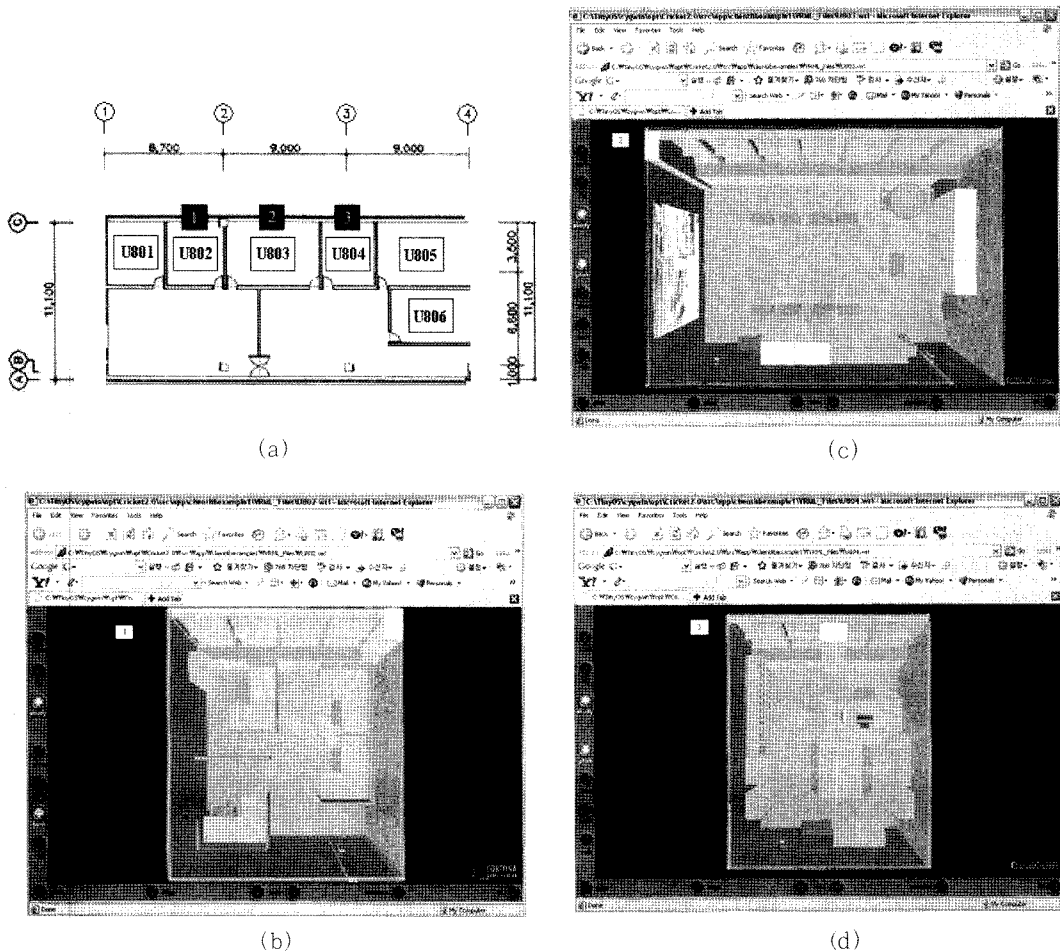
3D indoor environment modeling; (a) CAD floor map of modeled building, 8th floor U-IT building of Dongseo University, (b)-(d) The constructed indoor environment for each room.
